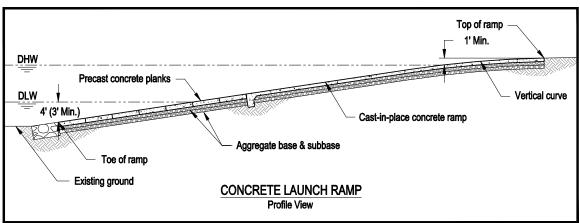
Design water levels as they relate to top and toe elevations of launch ramp
